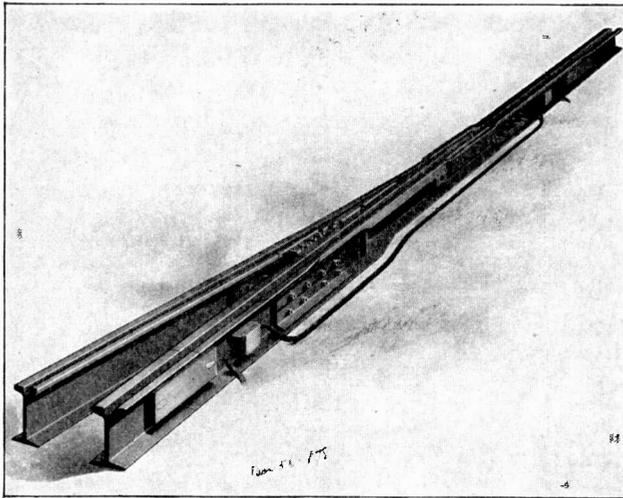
Switch-Piece, Showing Method of Bonding around Same by means of Copper Cable with Ends Welded to Rail.
